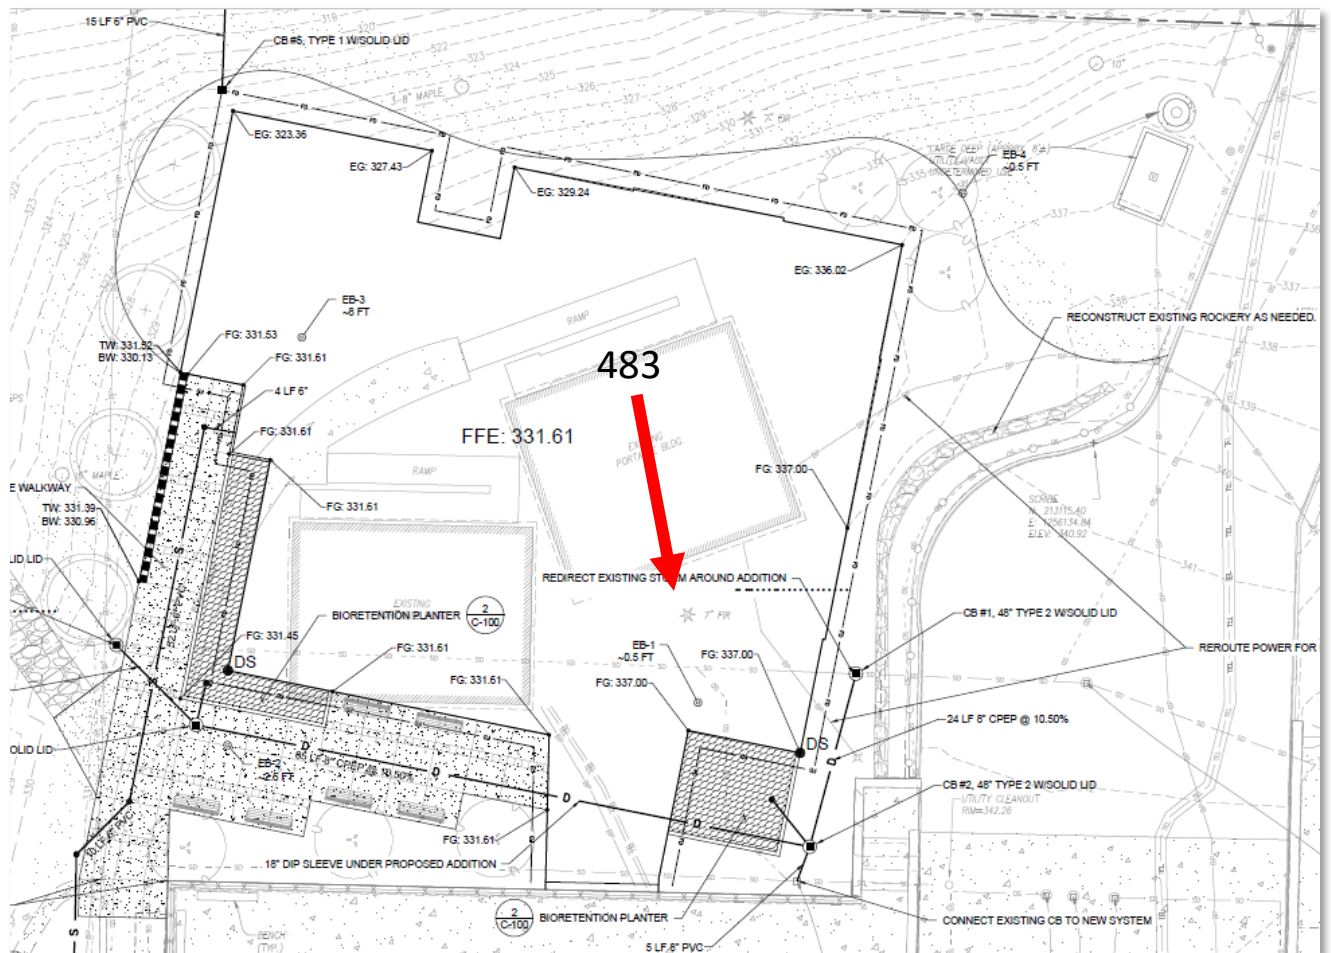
Section of the Civil Site Plan C-100 showing the location of tree 483 (Dated 07.15.2020). This tree is within the building envelop and will need to be removed for the construction of the proposed new classroom addition.
